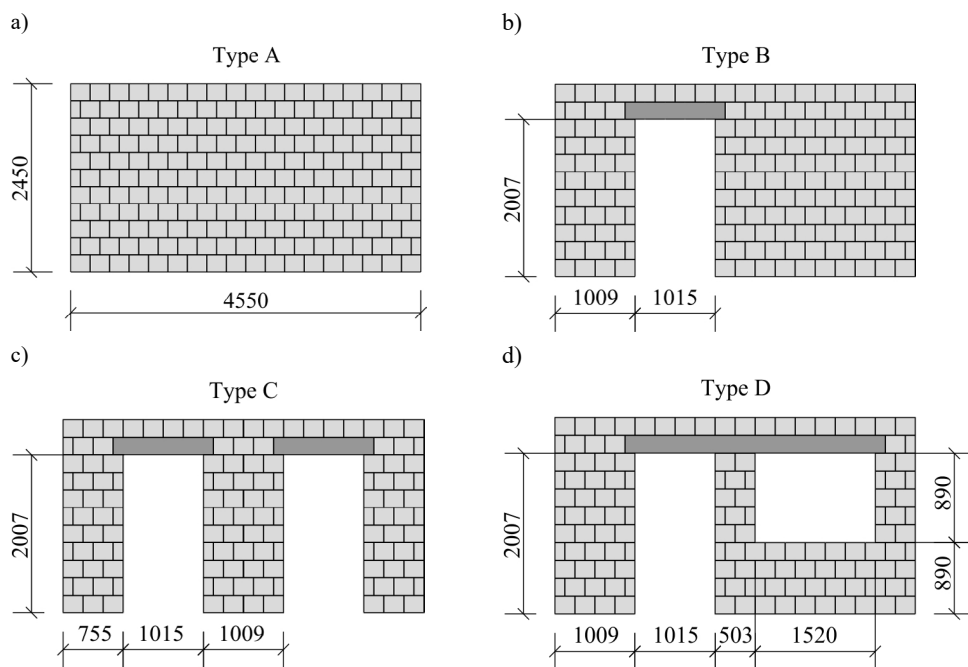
The full-scale specimens: a) without openings, b) with one asymmetrically arranged door opening, c) with two door openings, d) with door and window openings. Source: the author's own study
